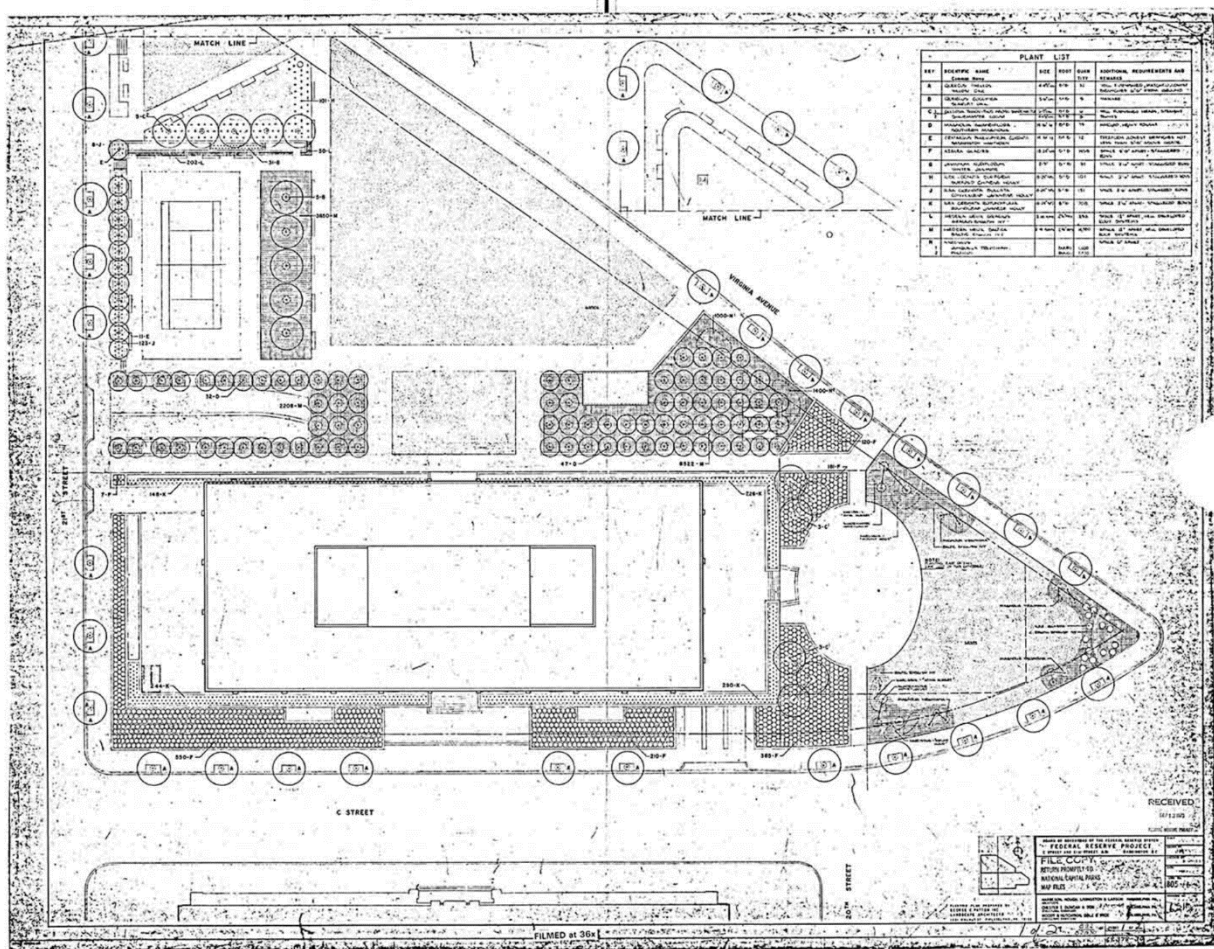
George E. Patton's design and planting plan for Reservation 378, 1973.
